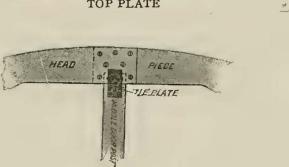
DETAILS OF HEAD PIECE AND POST JOINT
